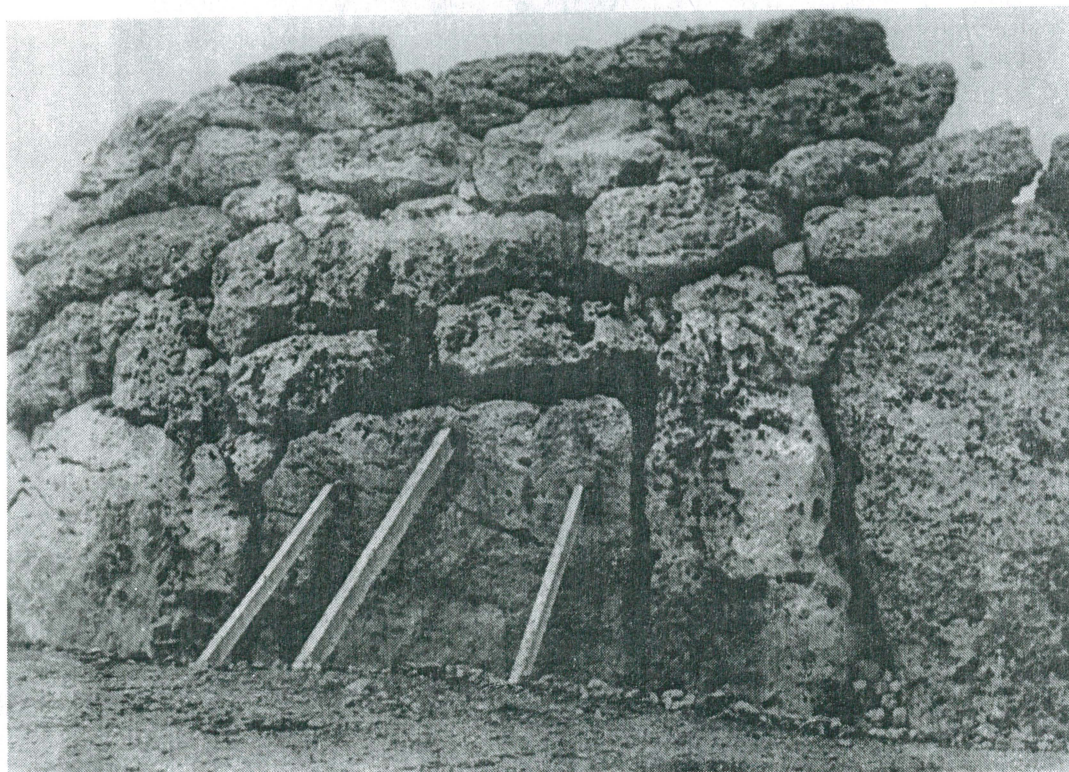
Steel joists propping up a megalith. Ggantija Temples, Gozo.
